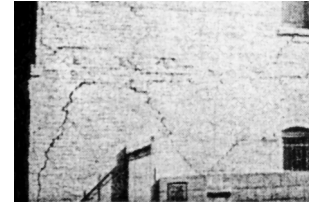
Cracks in Wall (Moehle, 1996)
